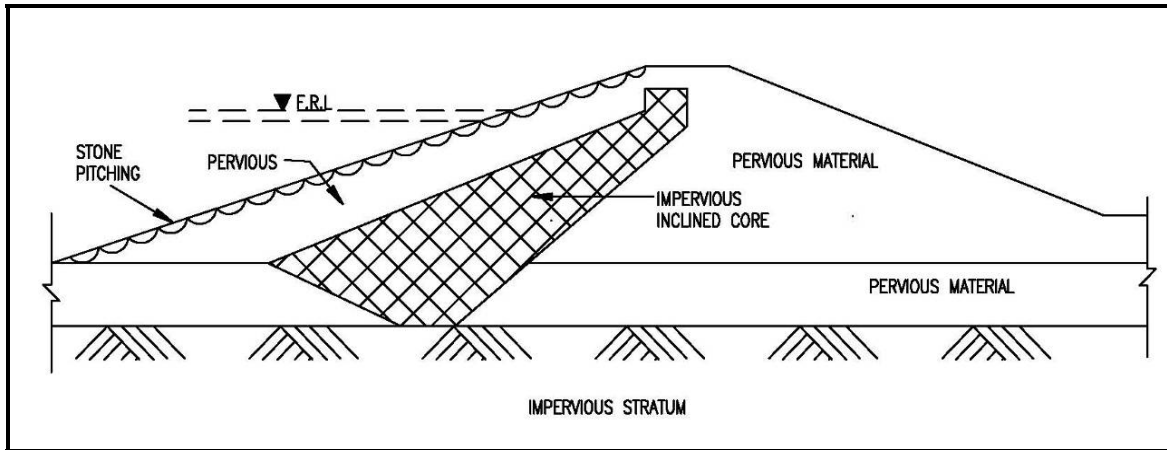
Typical Earth Dam Section with Pervious Foundation upto Small Depth
